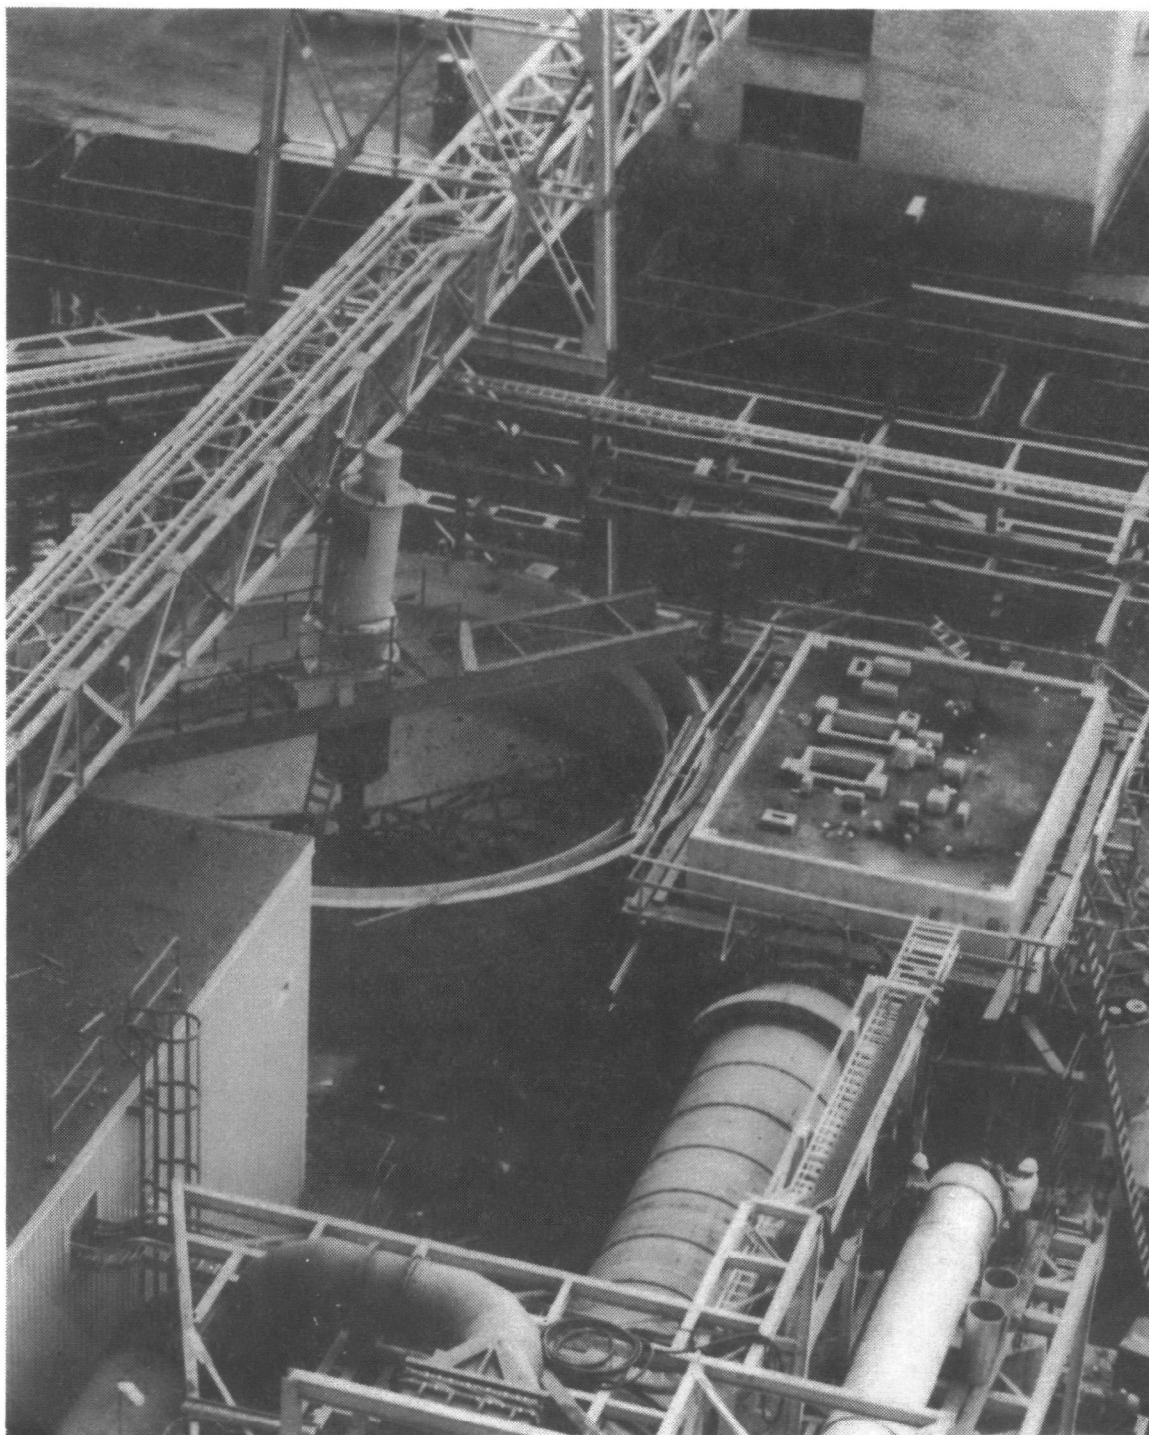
View of thickener tank, centrifuge foundations and MgSO_3 dryer. Overhead pipe rack carries coal to bunkers from coal handling building in background. Note empty coal cars behind thickener.
